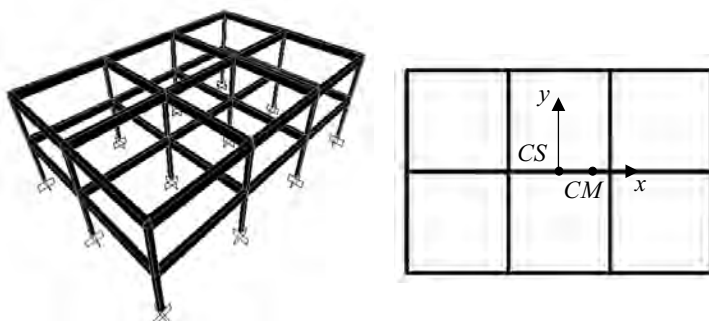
Studied two-storey frame RC structure: 3D view and plan.
